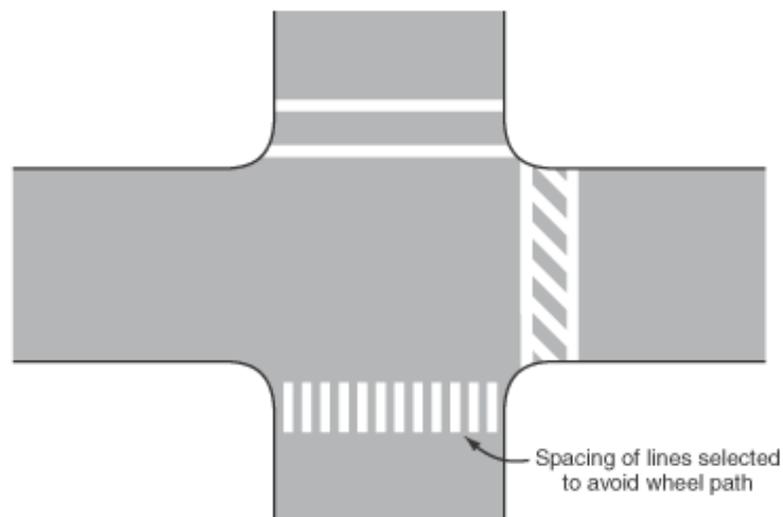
Illustration. An intersection with examples of crosswalk markings.
